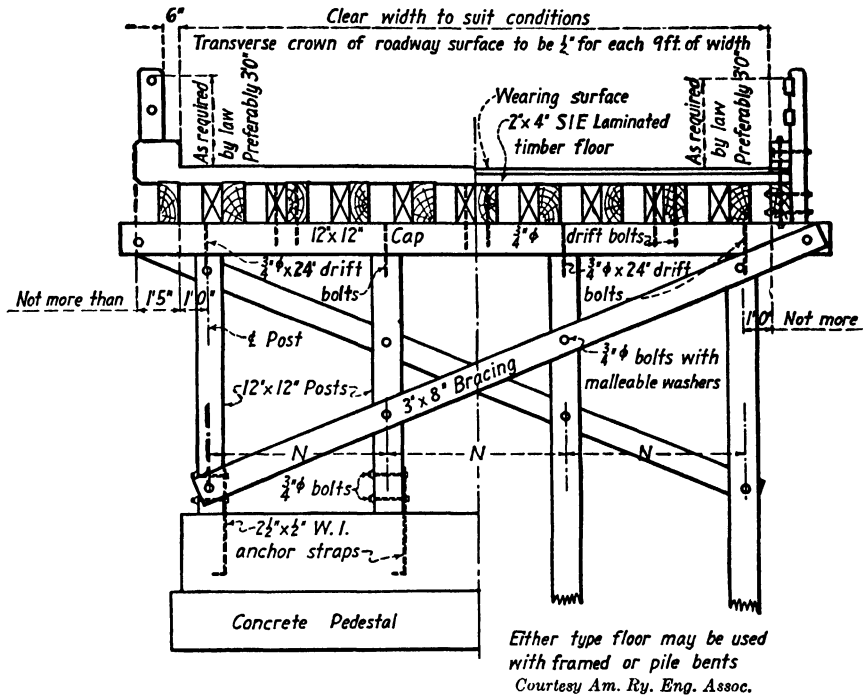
OVERHEAD WOOD HIGHWAY BRIDGE, II-15 LOADING.
